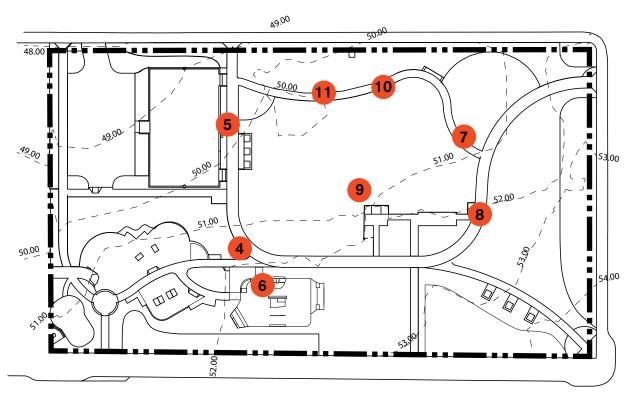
Existing Site, 1m Contours, Site Photo Locations
